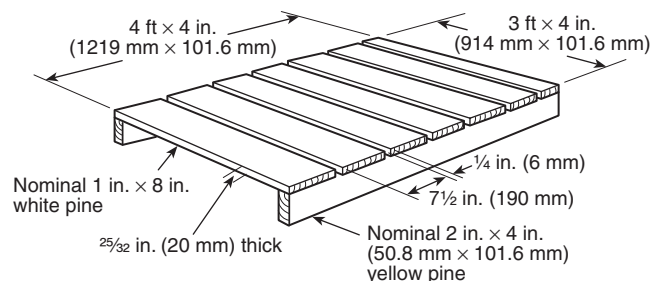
(d) Construction of test deck for other than wood shingles and shakes.
